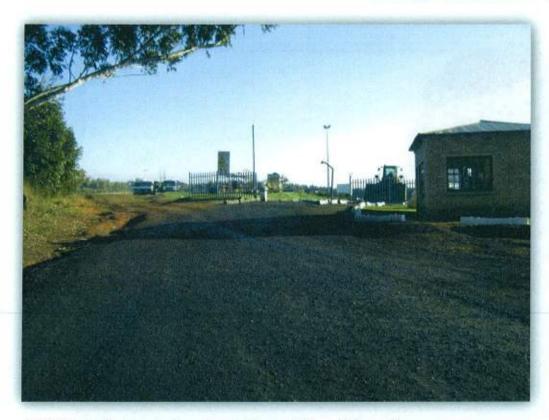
Entrance Road to Railway Siding (Photo 1)
